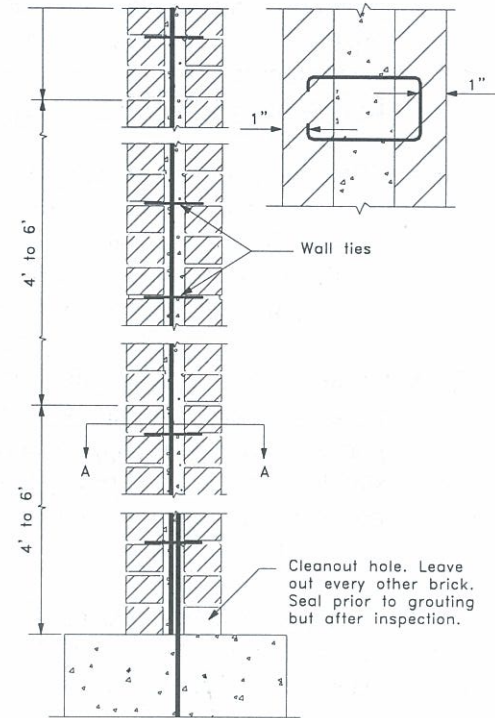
High lift grouting procedure for two wythe brick walls. (Cleanout holes are required)
